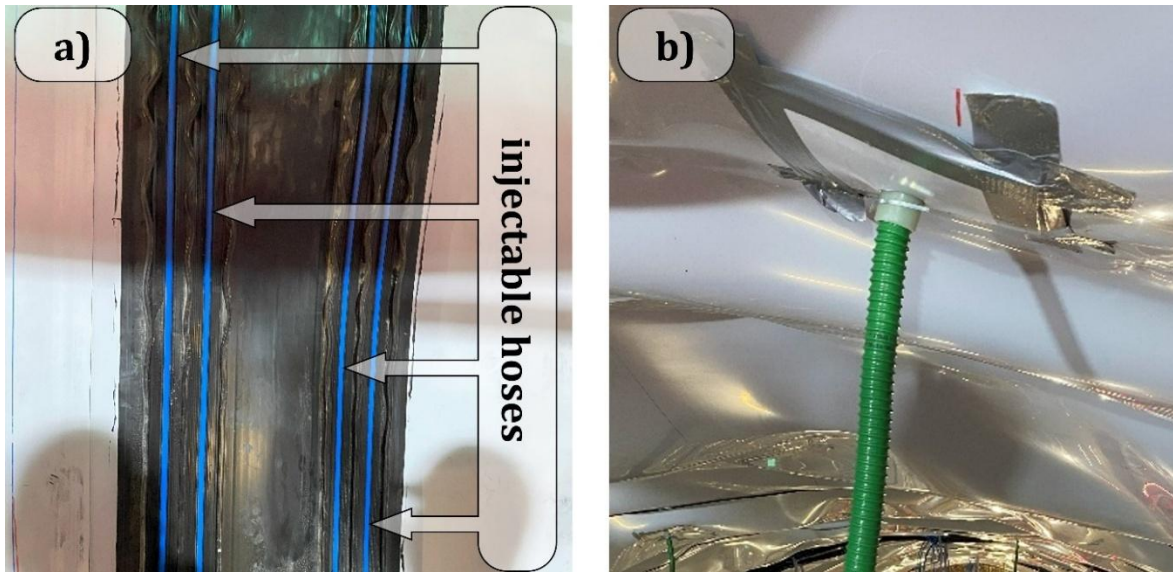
Components of the grouting system at the Wendlingen Large Curve, in the joint (a) and in the compartments (b) (source: IB Kirschke)
